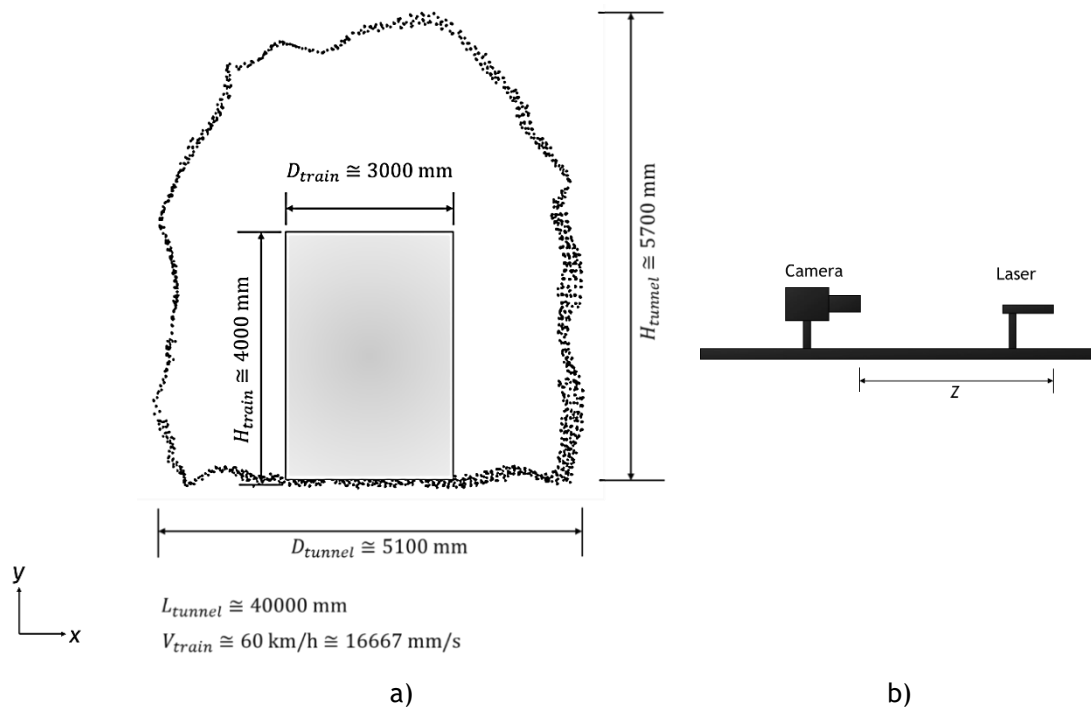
a) The Monte Seco railway tunnel detail and b) a schematic view on the designed system.
